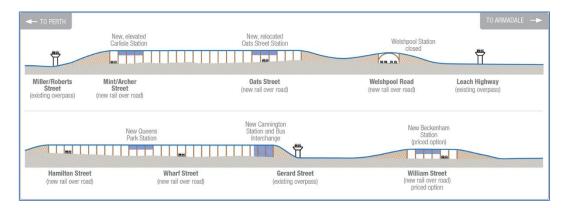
The Inner Armadale Level Crossing Removal Project will see new stations at Carlisle and Oats Street (Source: METRONET).
